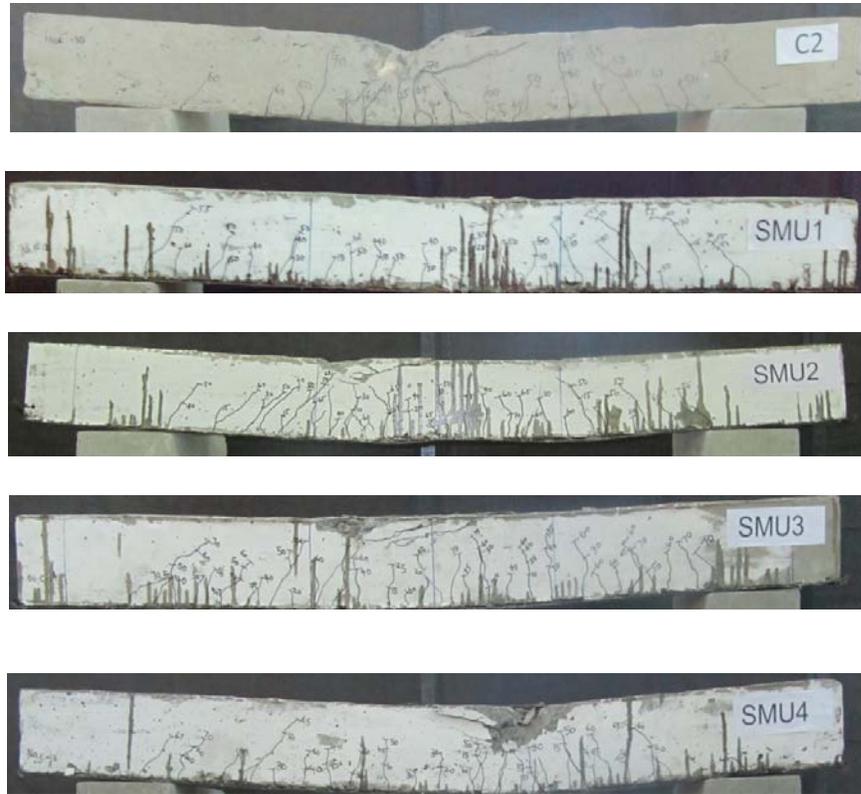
Failure Crack Pattern of Reference and Strengthened Beams
